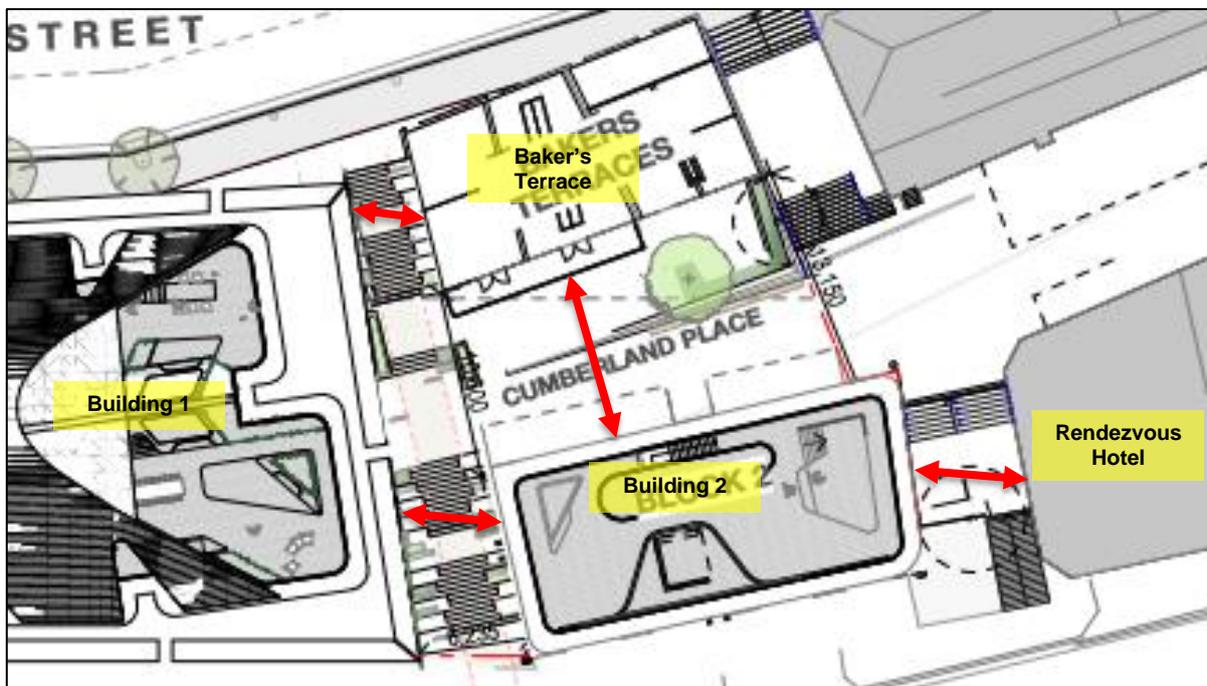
Proposed building separations (refer to Table 9) (Base source: Architectural plans)
